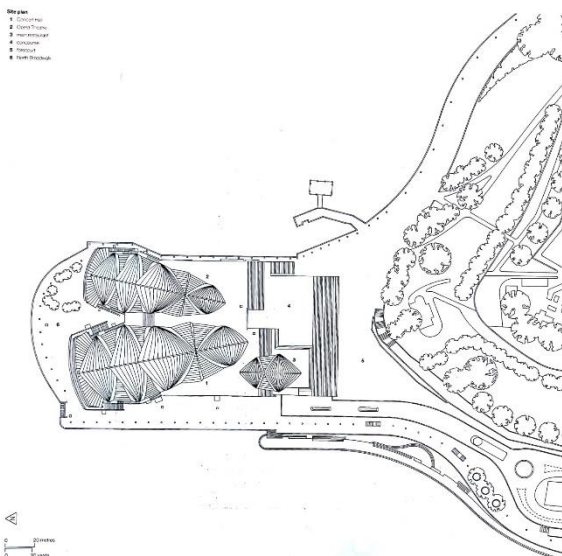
4: Site plan Public entrance (Source: Ziesler, 1973)
